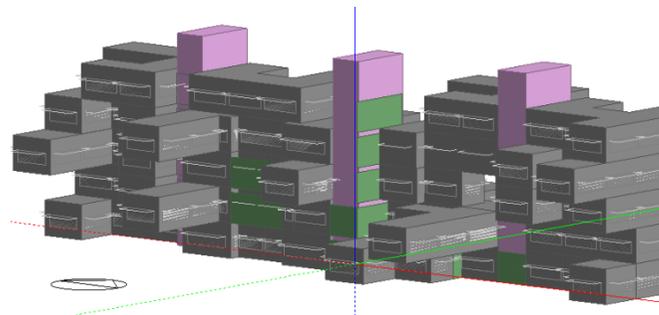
Horizontal shadings applied on southern façade, Source: Author.
